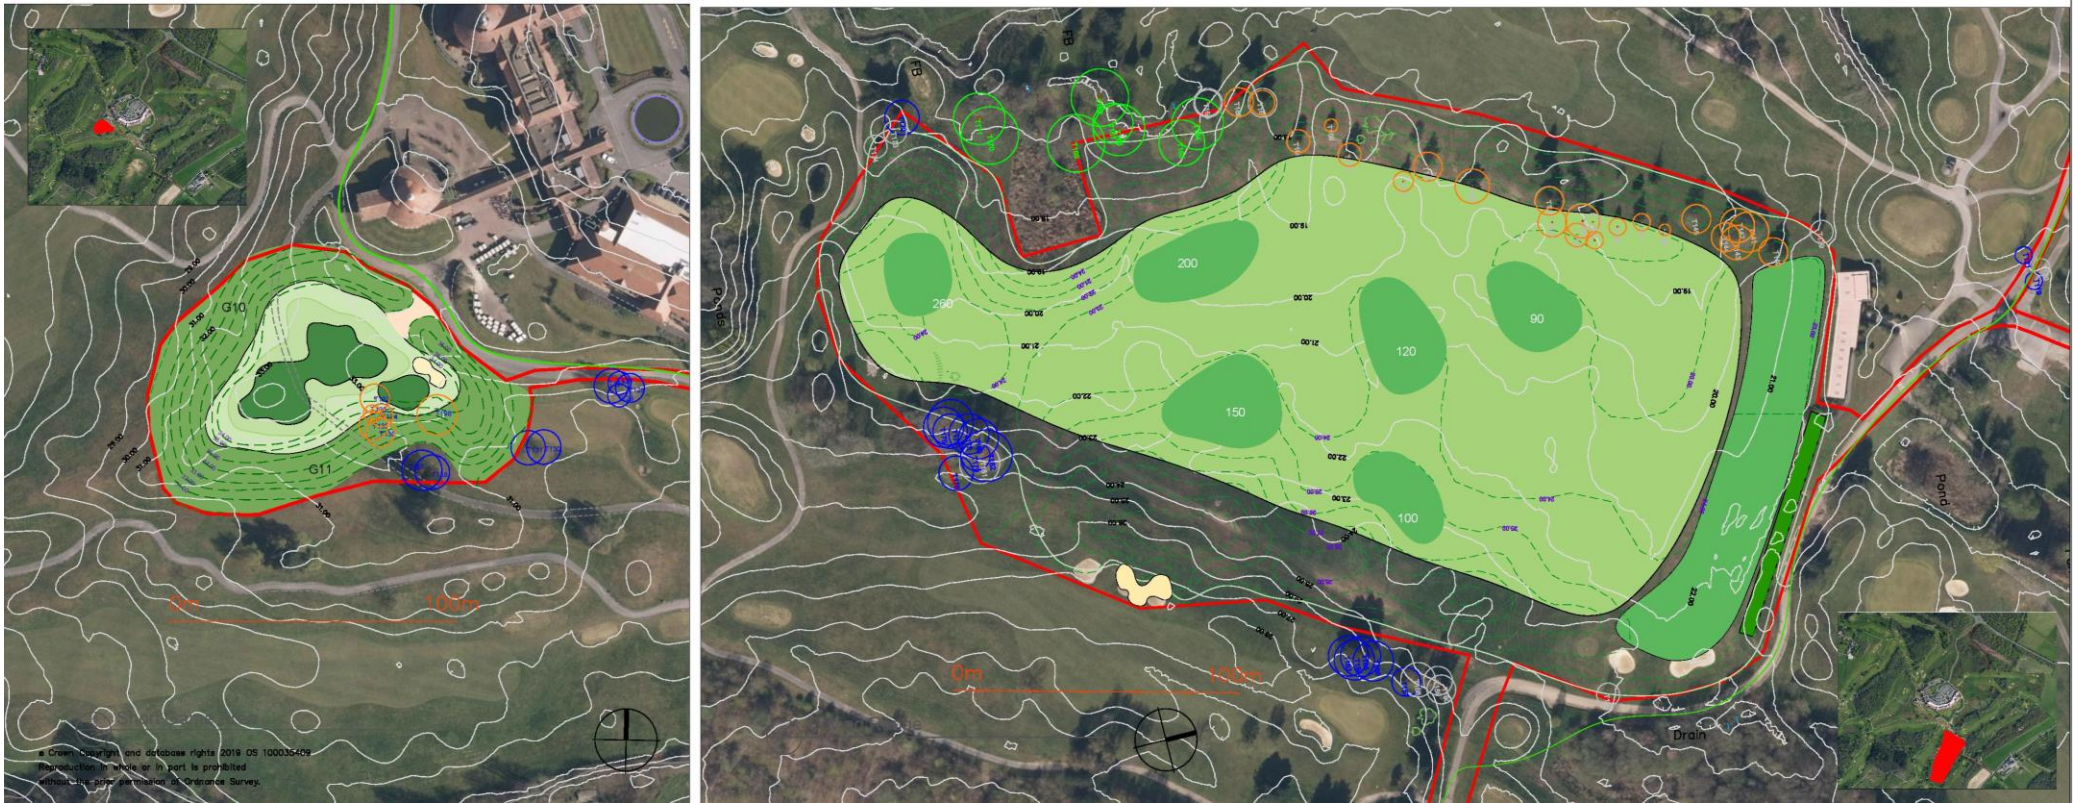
Proposed Layout & Grading Proposals - See also scaled plan WD800G01
